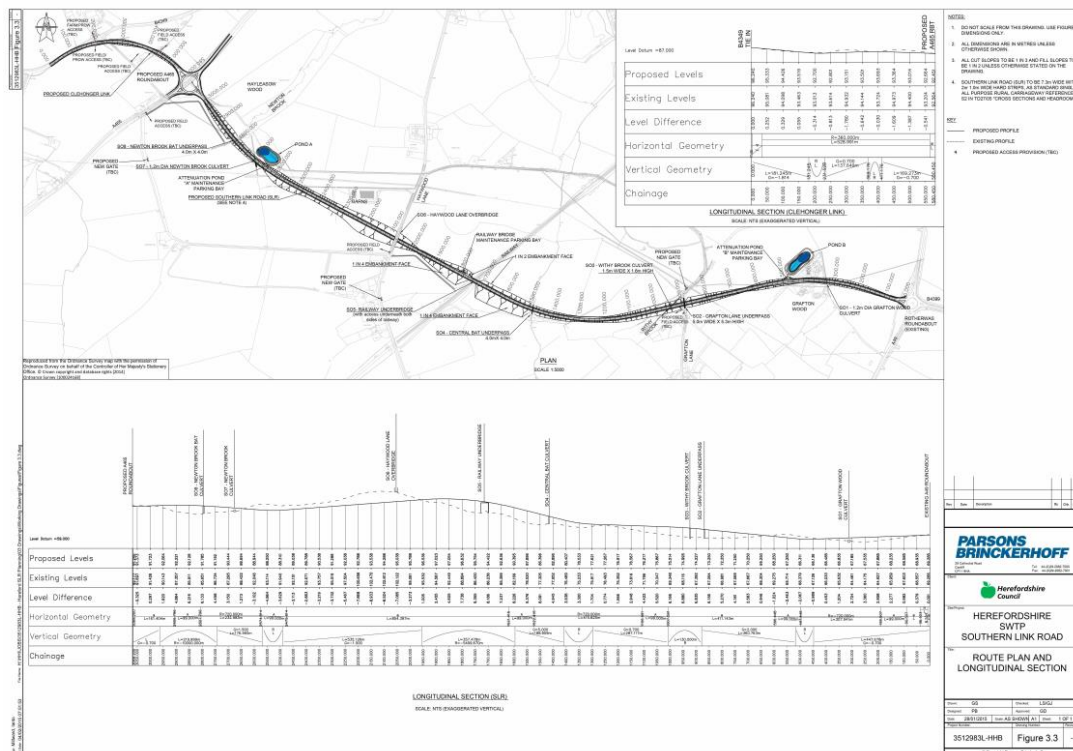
Current Route Plan and Longitudinal Section Drawing
